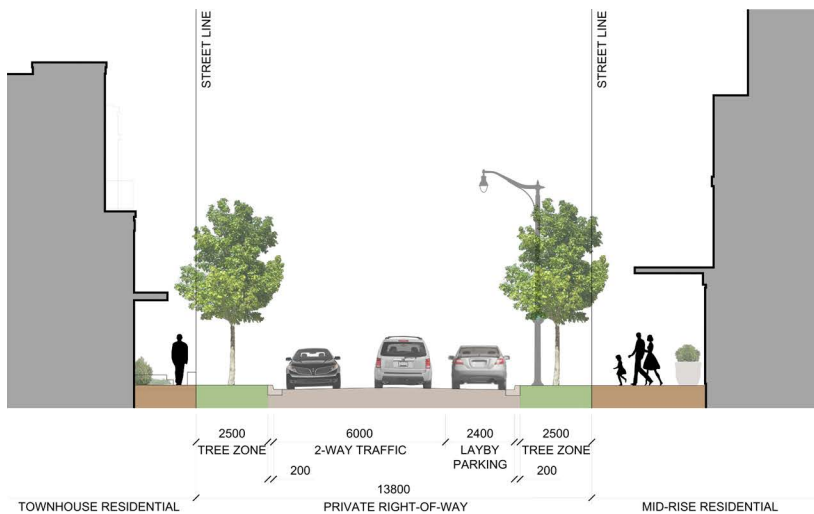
13.8m Shared Street - Private Condominium Driveway with On-Street Parking
